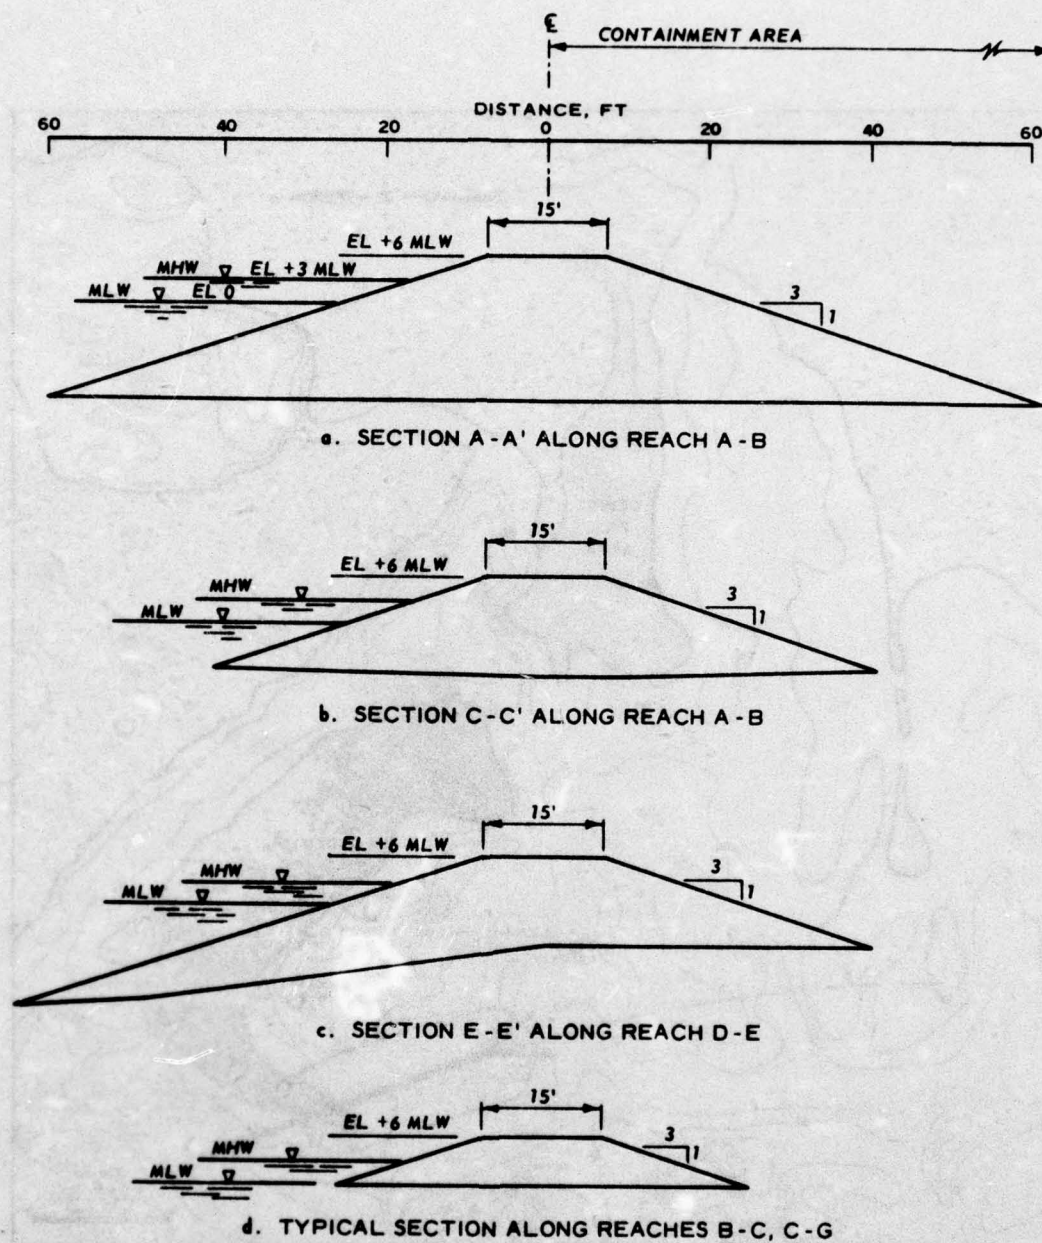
Cross sections for dumped fill (dike reaches and section locations are shown in Figure 7)
